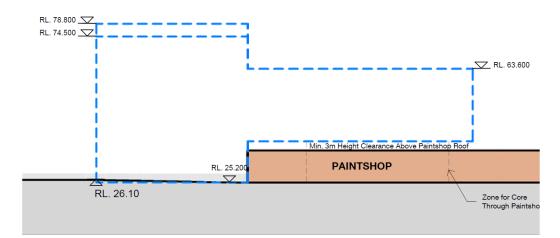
Building envelope section through K1 building and above Paint Shop building (view toward south)
